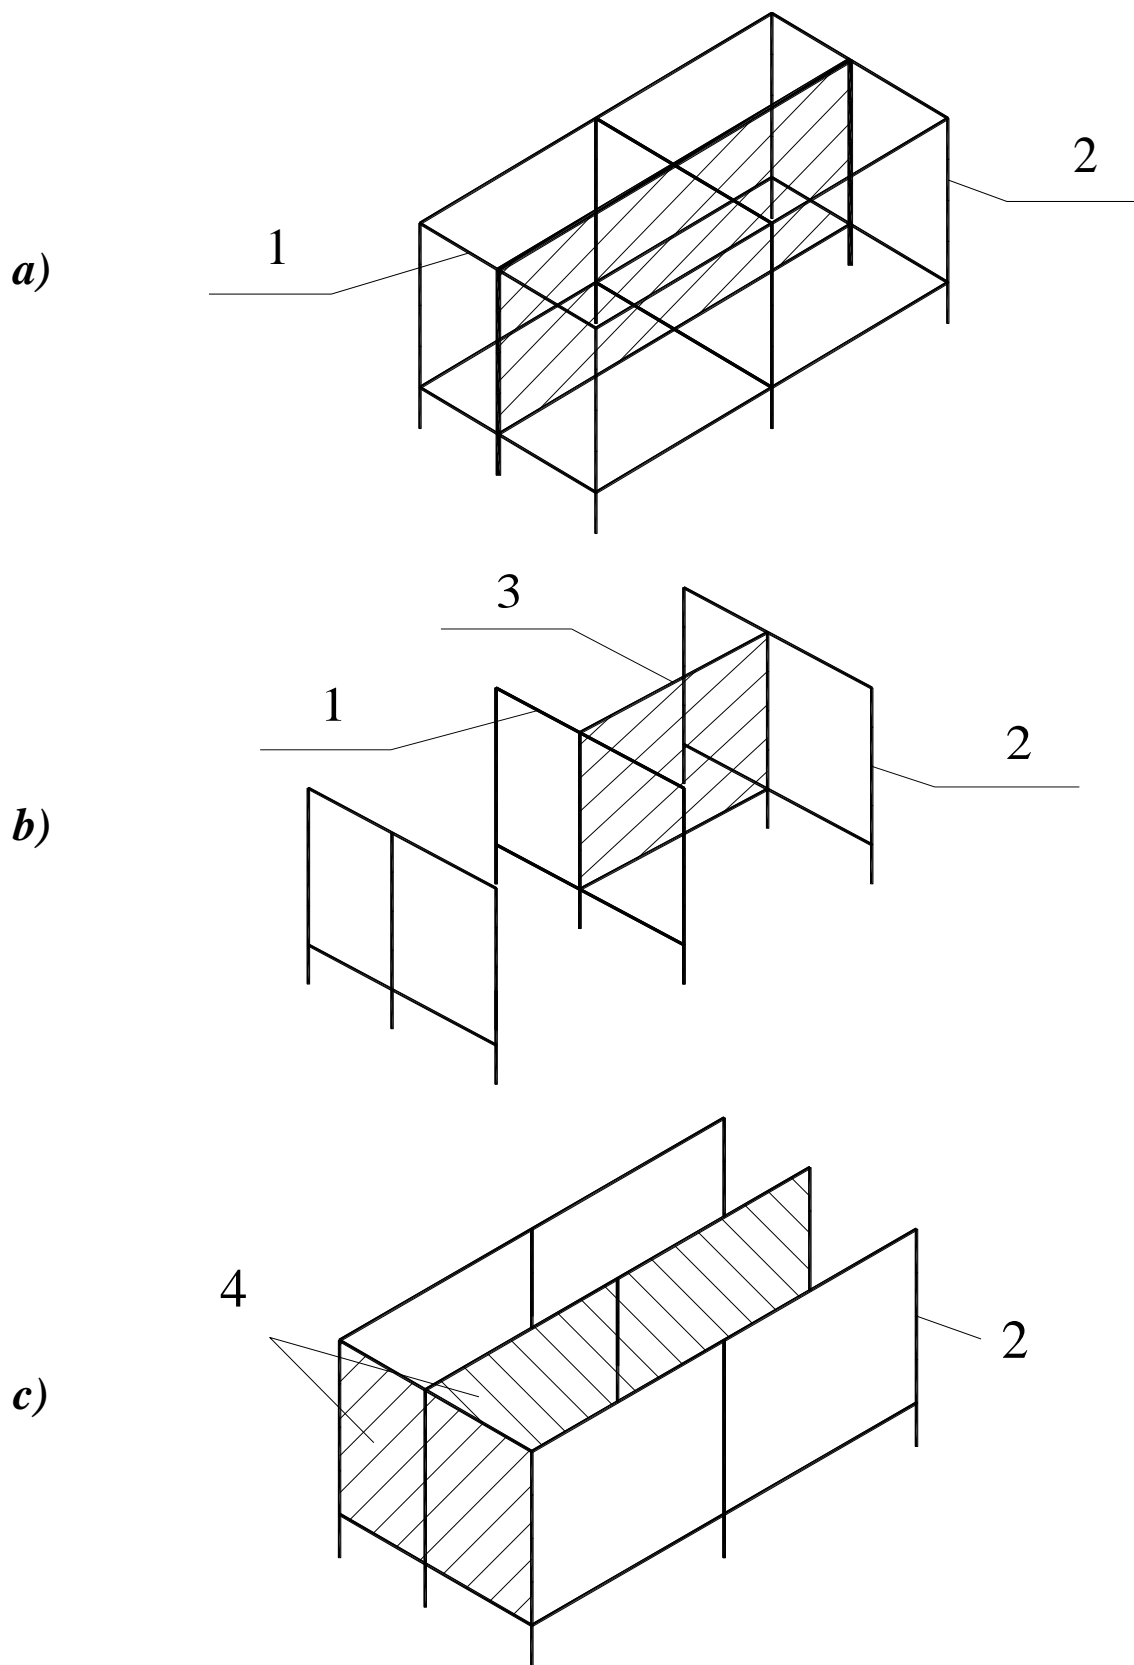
Main structural schemes of public buildings: a – frame with frames located in mutually perpendicular directions; b – frame-braced; c – mixed; 1 – beam; 2 – column; 3 – diaphragm of rigidity; 4 – plane-braced element
